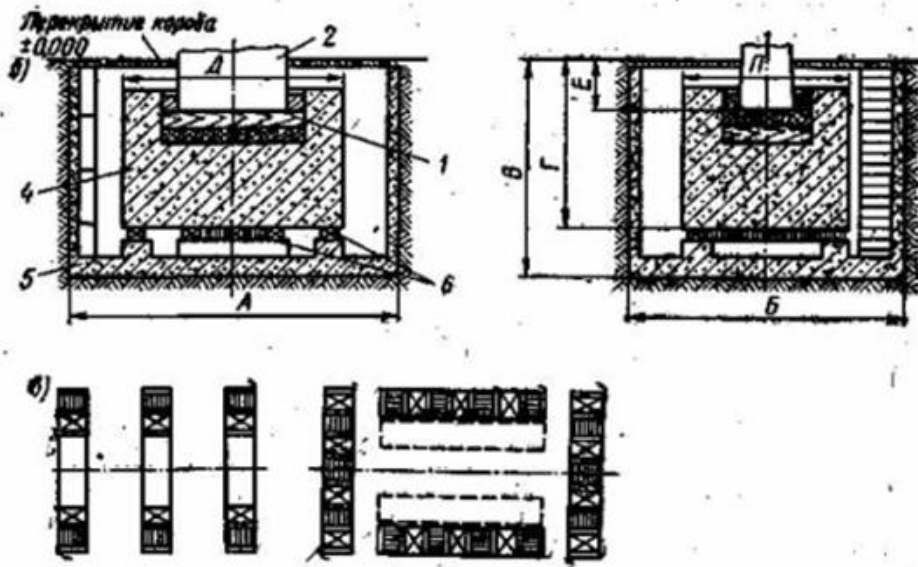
Schemes of the foundations under the steam stamping hammers: a, b – anti-vibration foundation, c – location of the vibration isolators; 1 – gasket under the anvil, 2 – anvil, 3 – ferroconcrete, 4 – foundation block, 5 – box under the foundation, 6 – vibration isolators.
